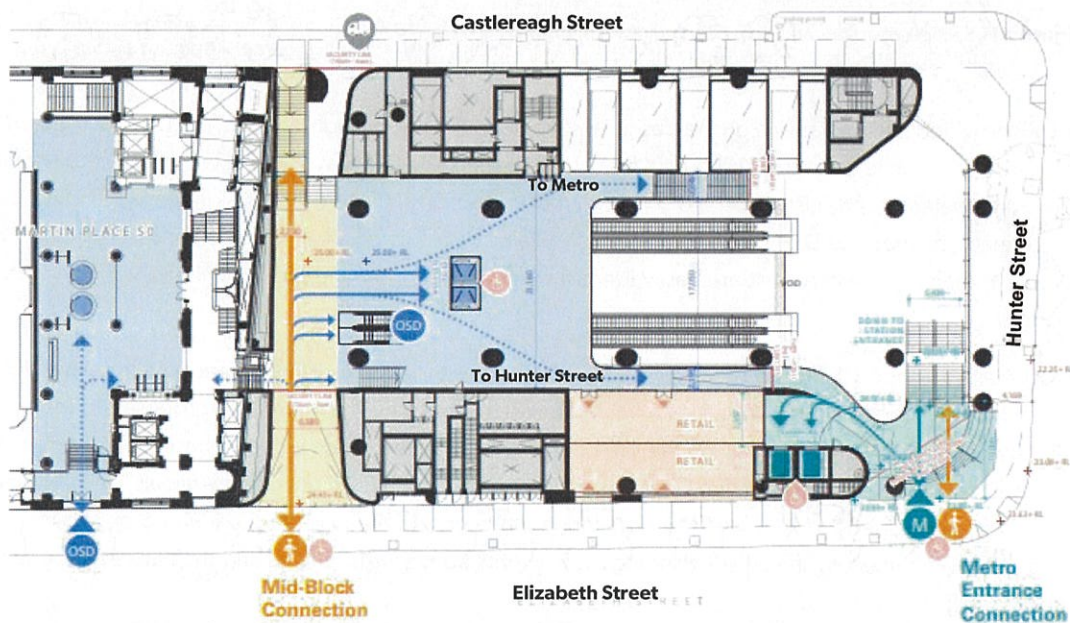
| Floor plan showing proposed mid-block through-site link (Source: Applicant's RTS)
